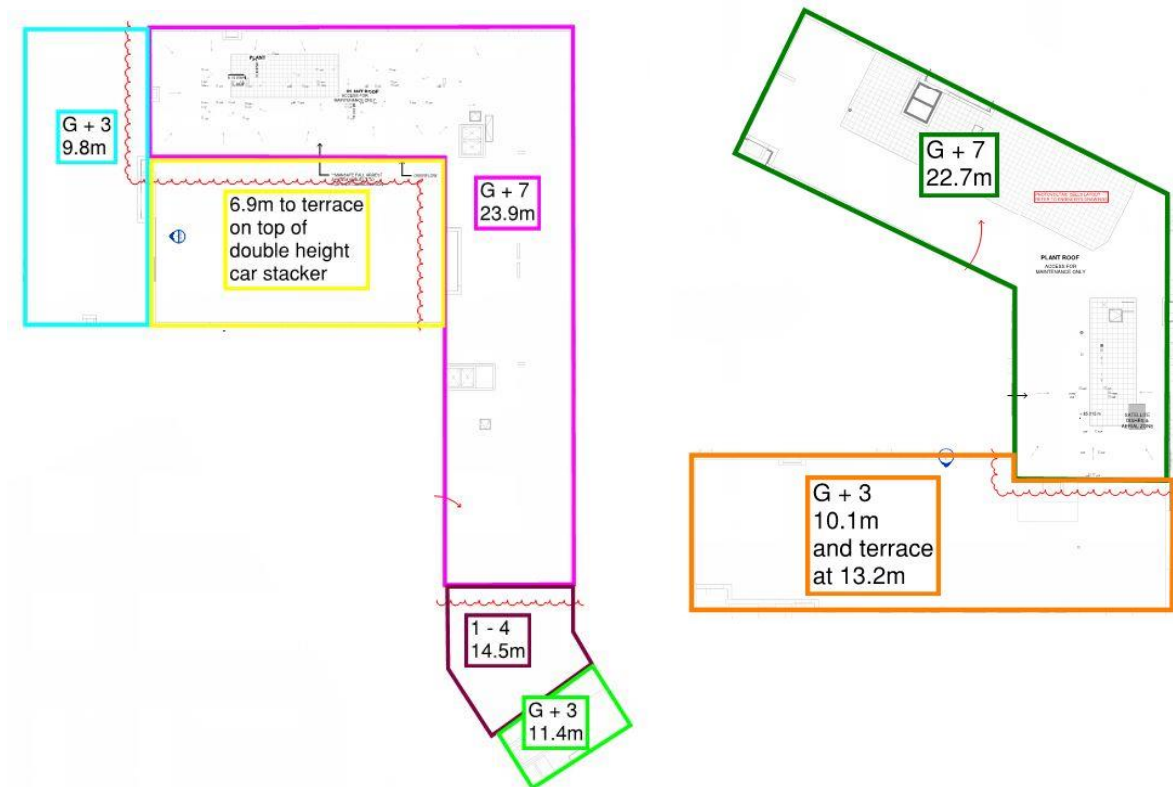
Building Heights from fire service access level to top occupied floor level or terrace where applicable.
